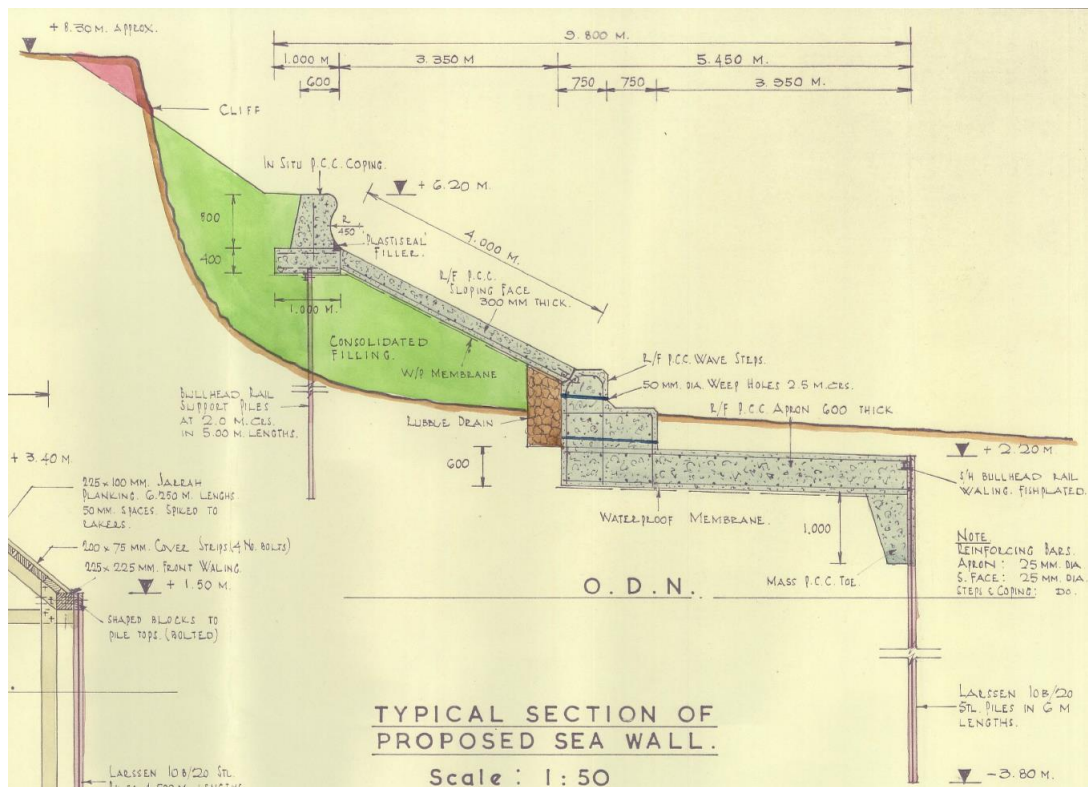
Detail of seawall and promenade at the back of the beach at Walcott
